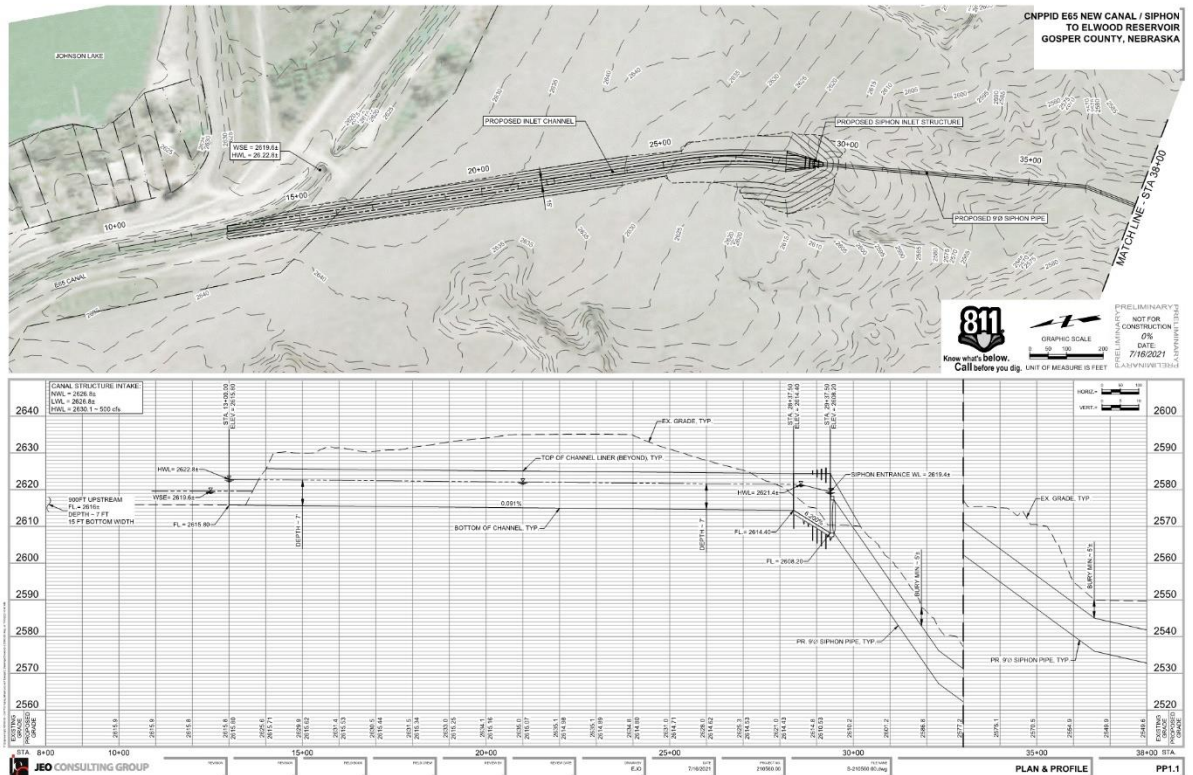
Preliminary Design Plan and Profile Sheet 1.1
